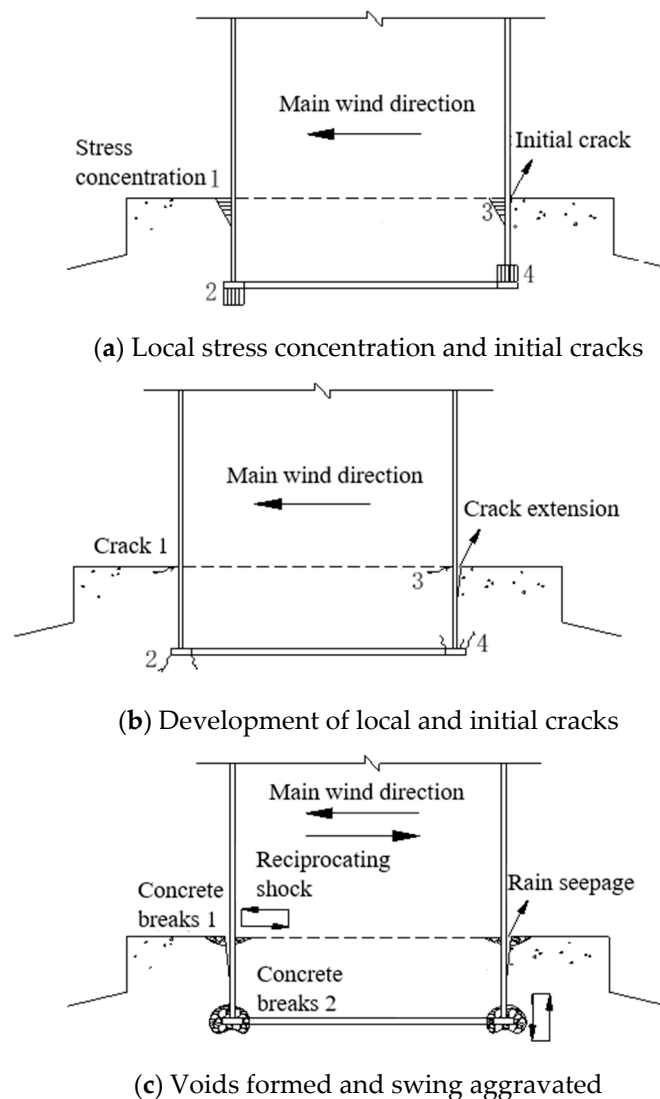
Damage mechanism of embedded-ring foundation.
